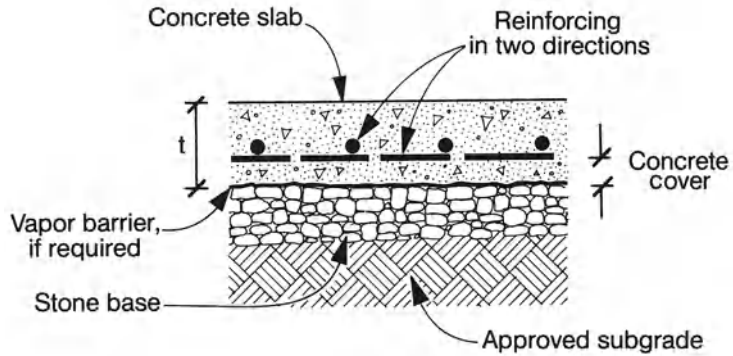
Typical detail of a slab on ground. Concrete cover over reinforcing to be 1½" for slabs up to 5" thick, 2" for slabs over.
